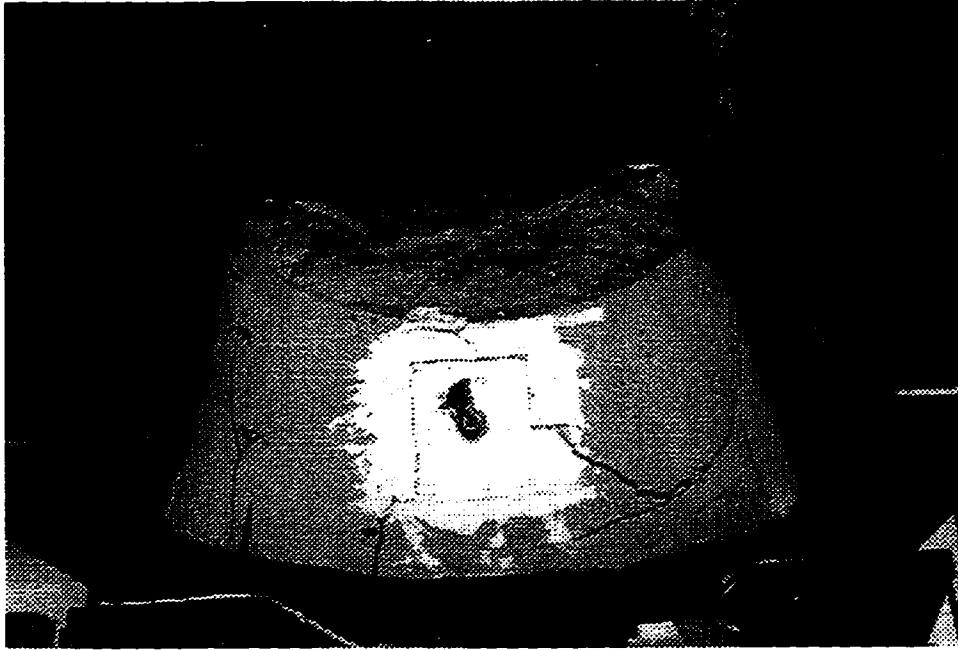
Photo of Cracks in Diaphragm of Eccentrically Loaded Girder
